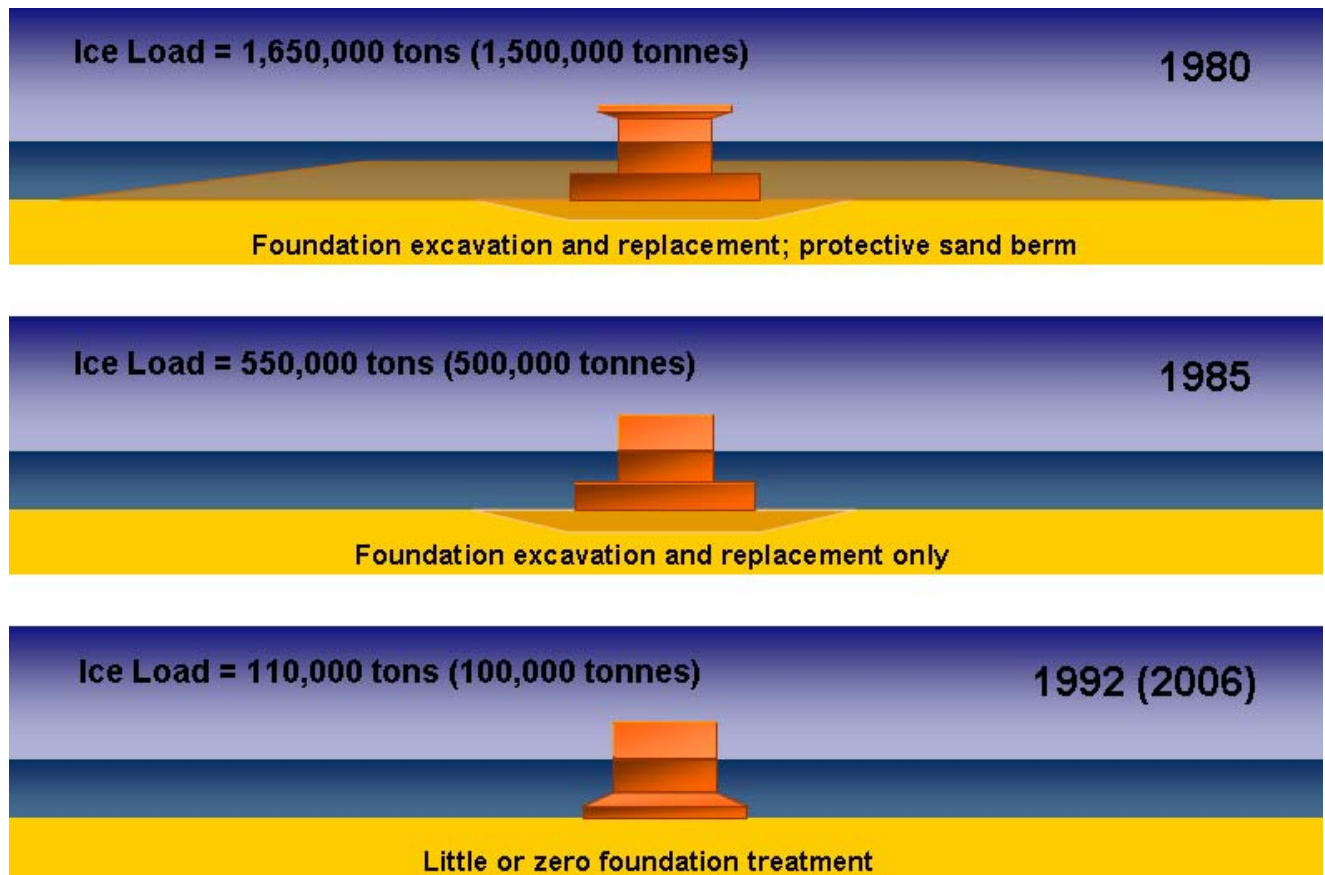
Evolution of Arctic Structure Loads and Foundation Requirements
